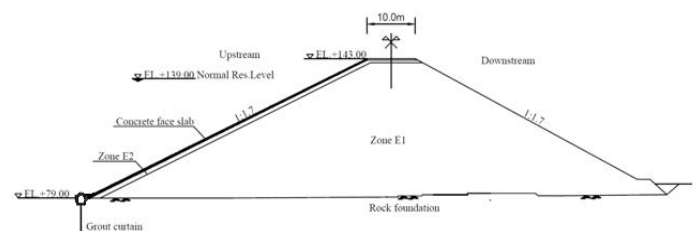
Typical cross-section of El-Agrem concrete face rockfill dam
